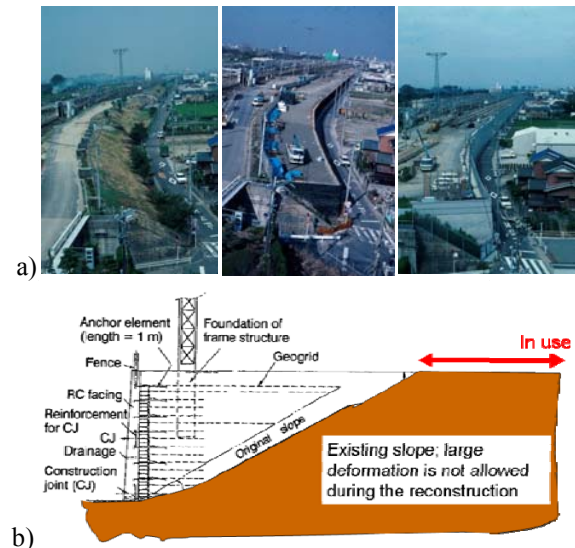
a) Before, during, and after reconstruction of gentle embankment slope to a GRS RW having a FHR facing; and b) typical cross-section, a yard for bullet trains (Shinkan-Sen), Biwazima, Nagoya; average wall height= 5 m; total length= 930 m; & construction period= 1990 -1991 (Tatsuoka et al., 1997).
